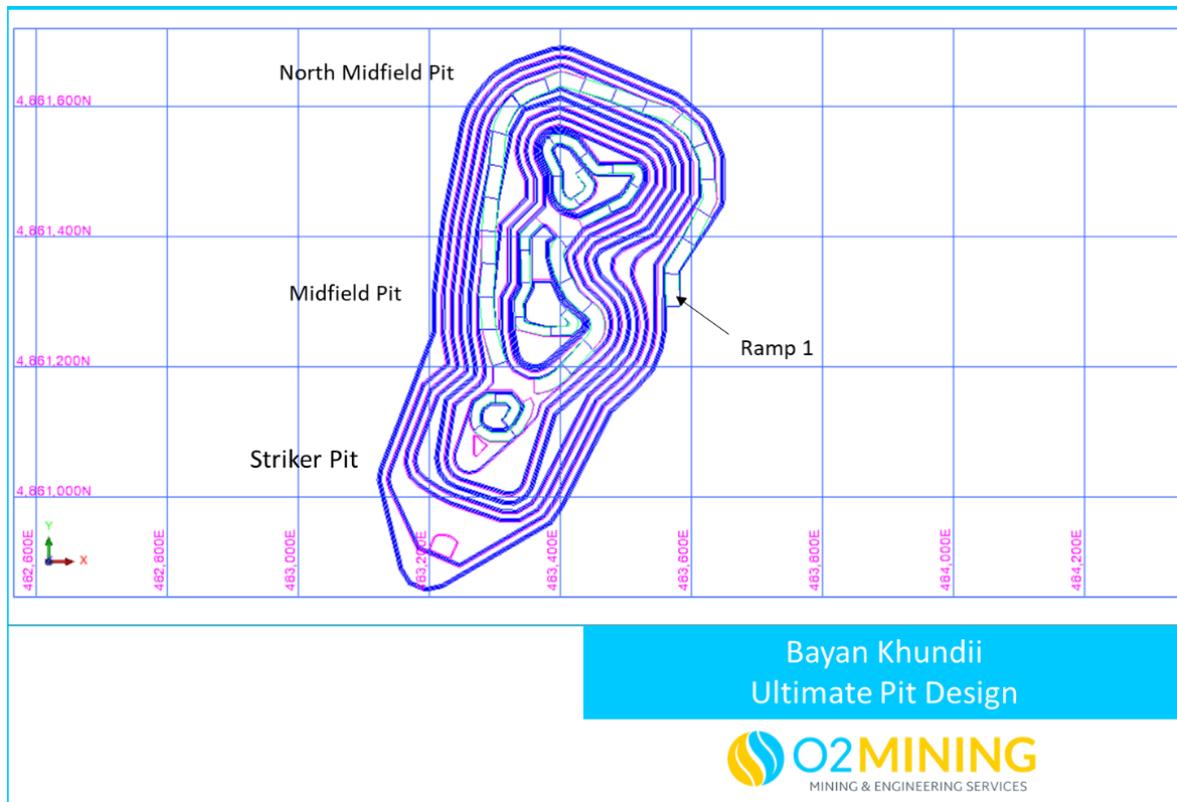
BK Ultimate Pit Design – Plan View (Source O2 2023)
